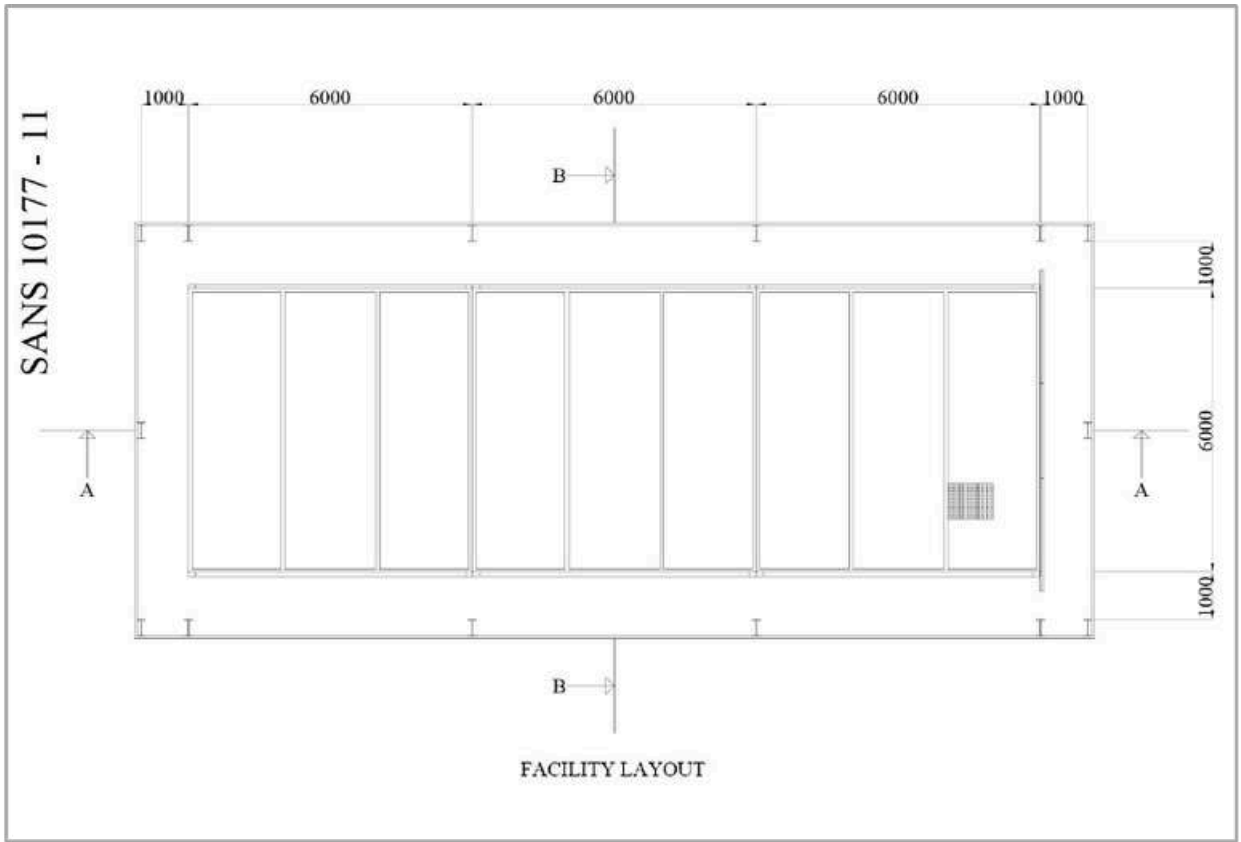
SANS 10177 – Part 11 test facility with specimen frames
